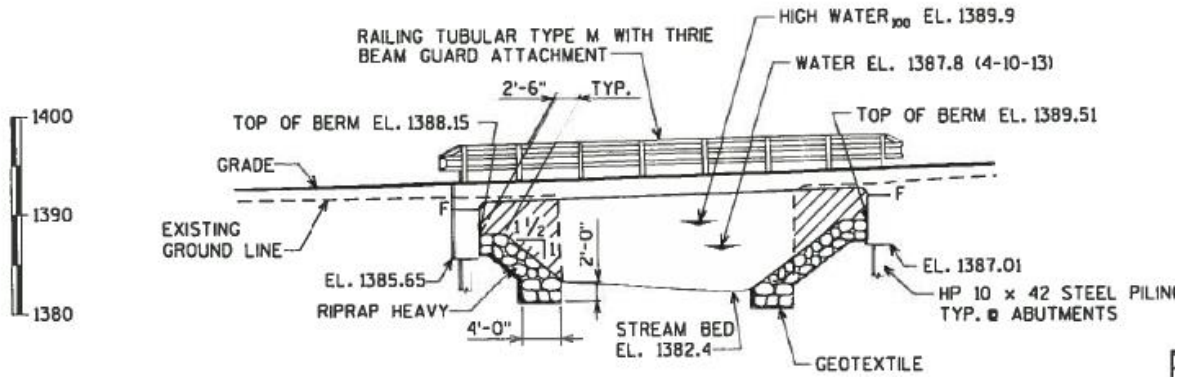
Hobbles Creek Bridge cross section (from project plans)
